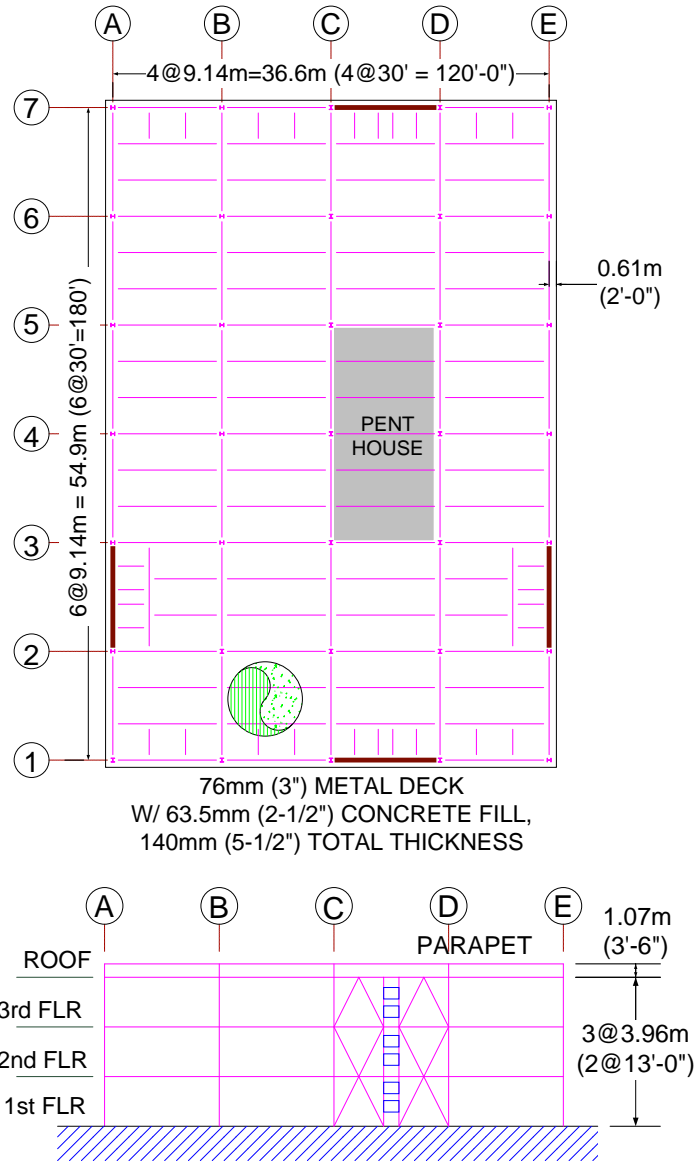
Prototype Building Typical Floor and Roof Framing Plan (top), and Elevation (bottom)
